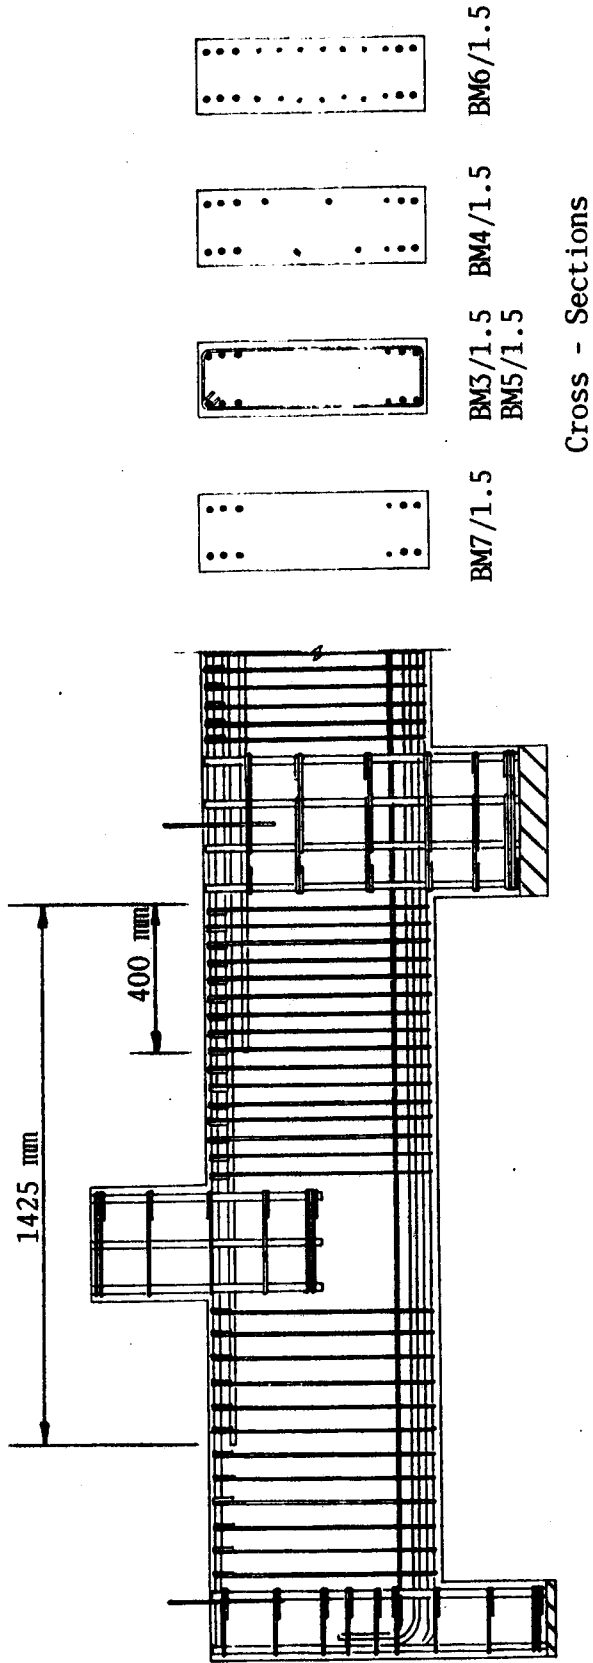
Beam 3/1.5, 4/1.5, 5/1.5, 6/1.5, and 7/1.5 Reinforcement Details
